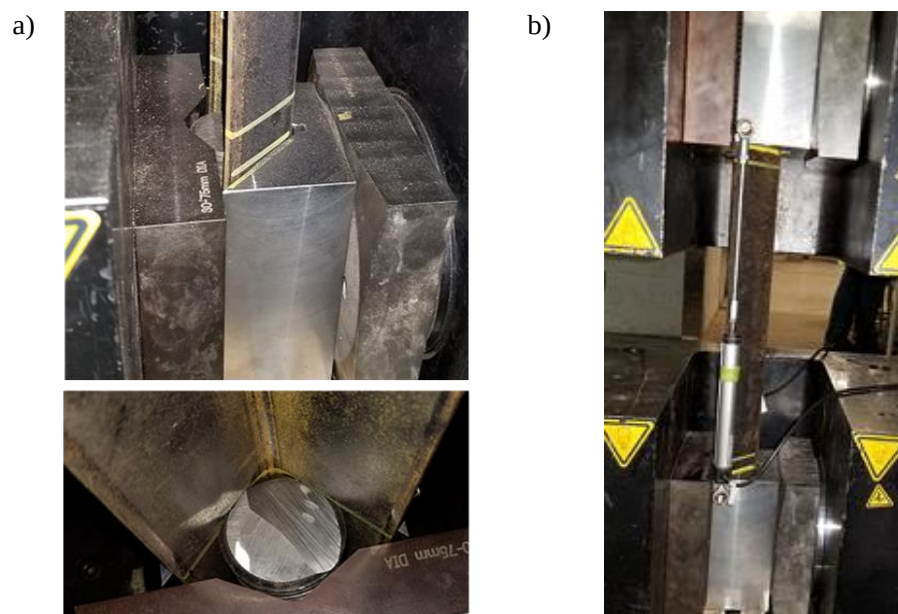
Tensile test setup on full size L64x64x6 specimens: a) Filler block and steel rod used in the grips; b) LVDT mounted on the filler blocks.
